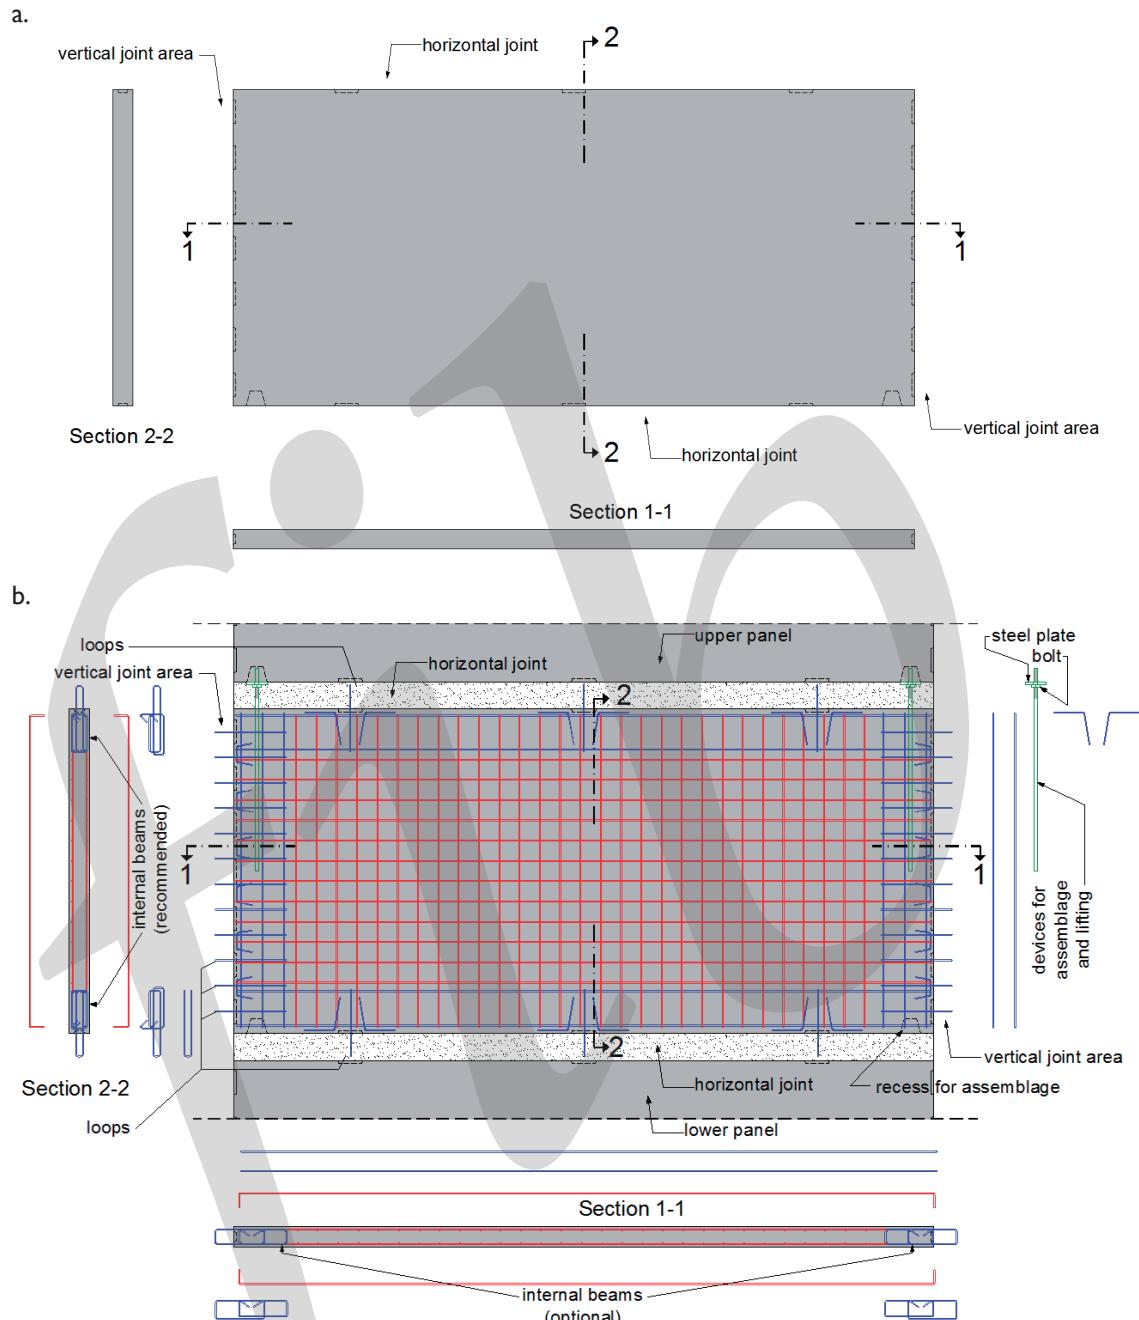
a. Geometry of a solid wall panel where key density along vertical joint is about 50%
